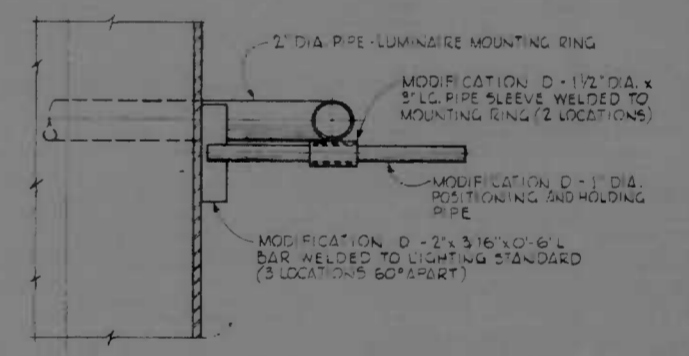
DETAIL AT BASE OF STANDARD TYPE I AND II INSTALLATIONS NOT TO SCALE
